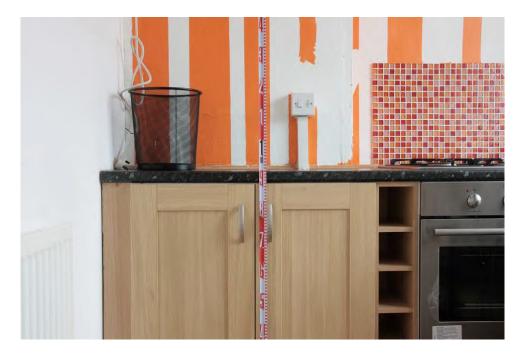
Original chimney breast in Kitchen, looking south-west (LMSC16 D100 (86))
